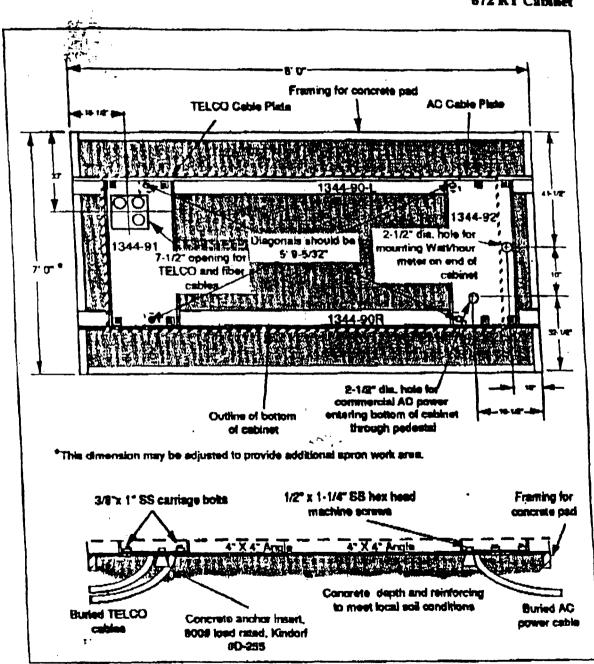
Minimum Pad Dimensions and Reusable Template Placement
